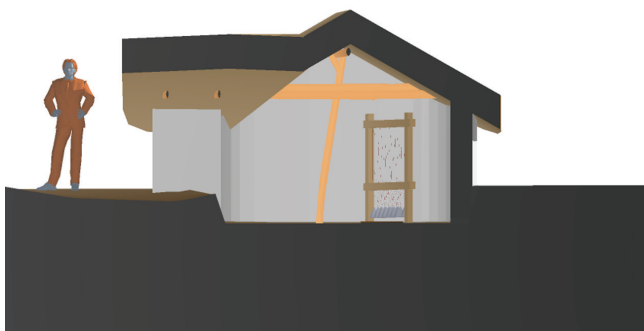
House #100 at Polgár site nr. 1 – reconstructed cross-section.
